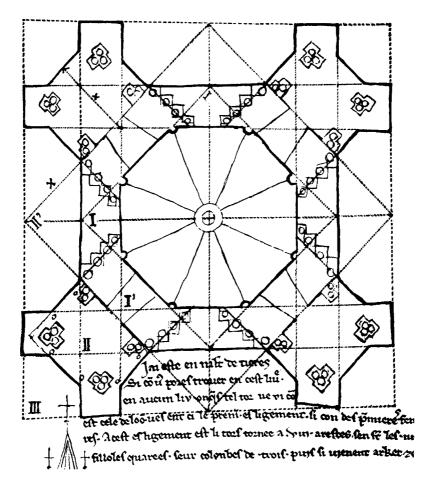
Plan, Laon tower, after Villard, fol. 9v, demonstrating the application of quadrature
